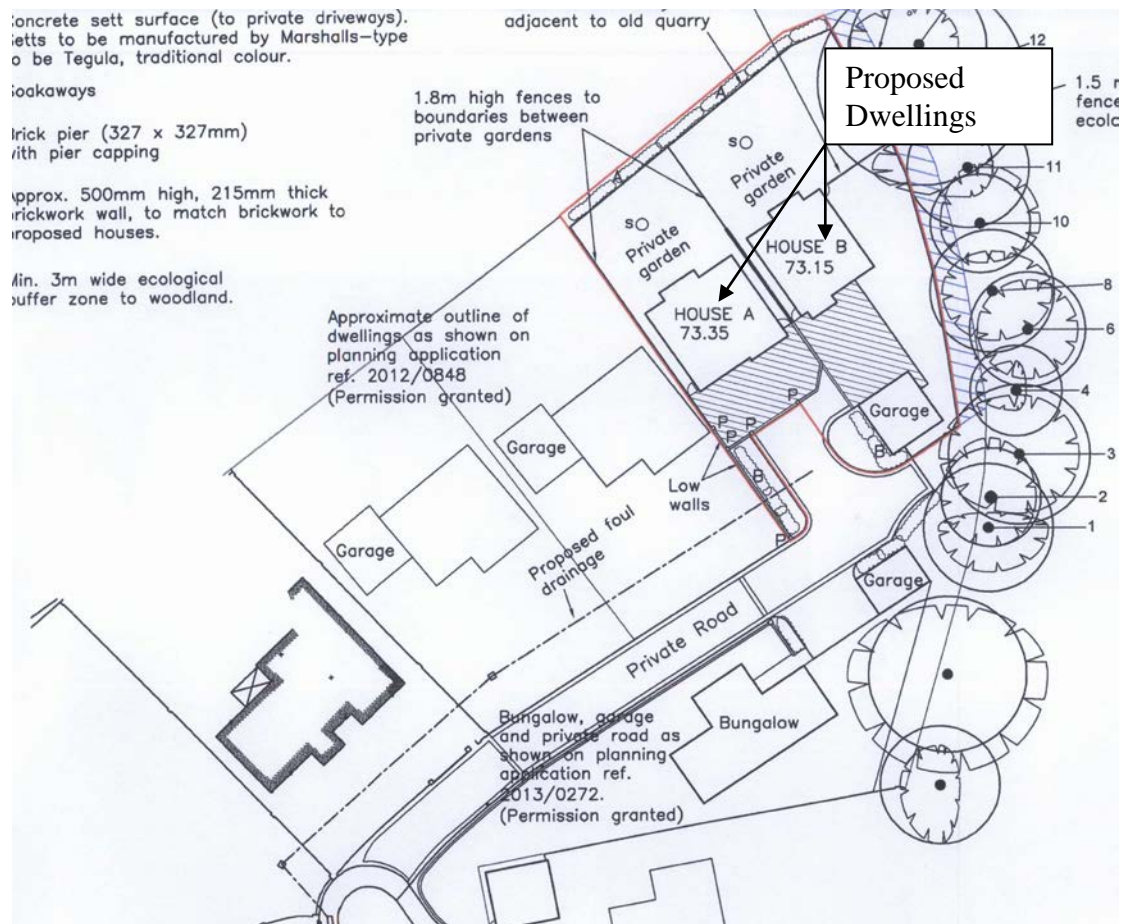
Layout plan showing the 2 no. proposed dwellings together with 3 no. dwellings which already have the benefit of planning permission but have not yet commenced (5 in total)
